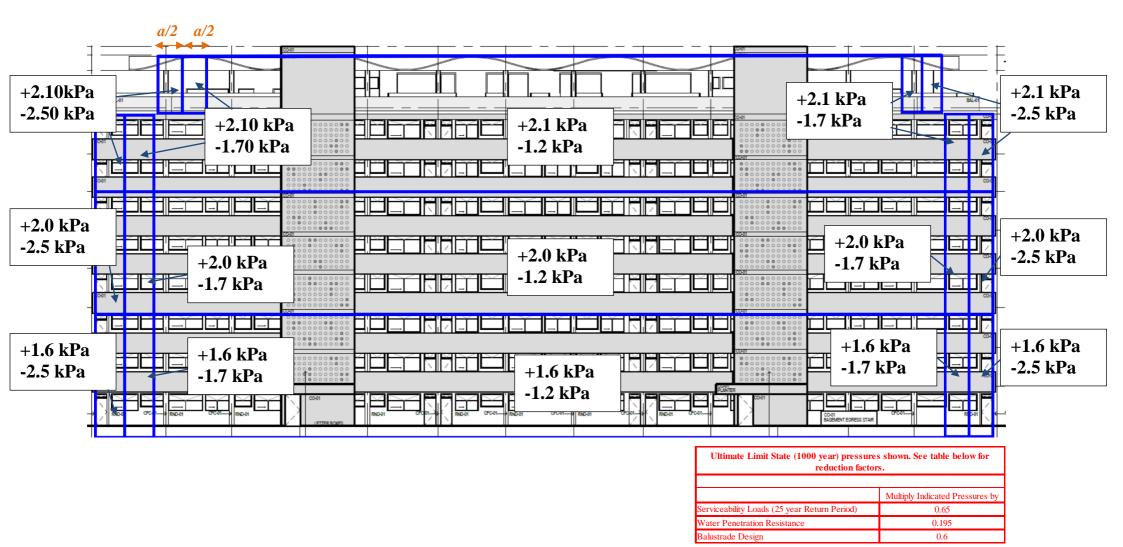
1000-year return period design pressures – West elevation. a = 4.4 m.
